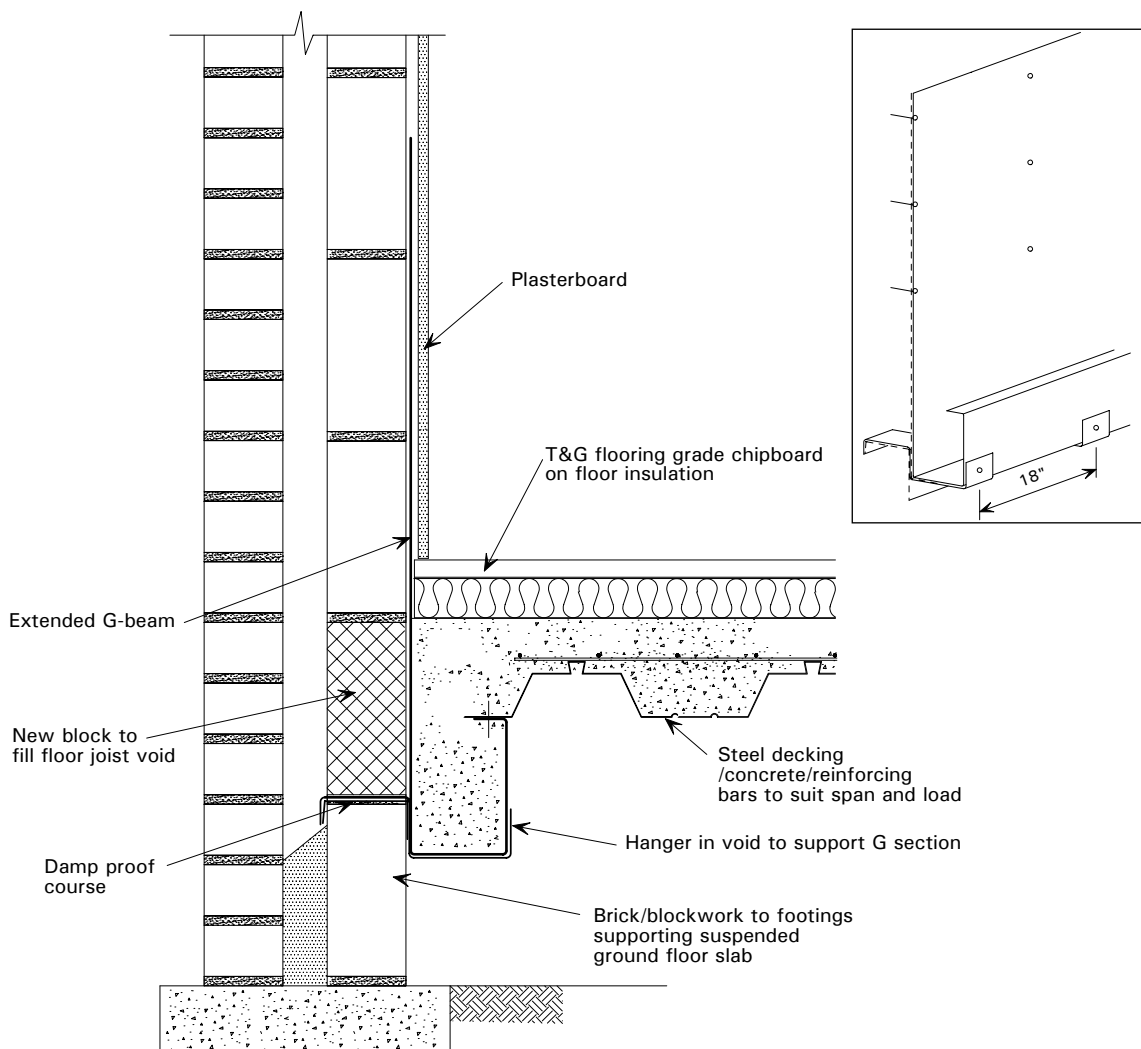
Composite ground floor with upstand light steel edge beam (extended G-beam) to replace flood damaged timber floor. Inset shows the extended G-beam.
